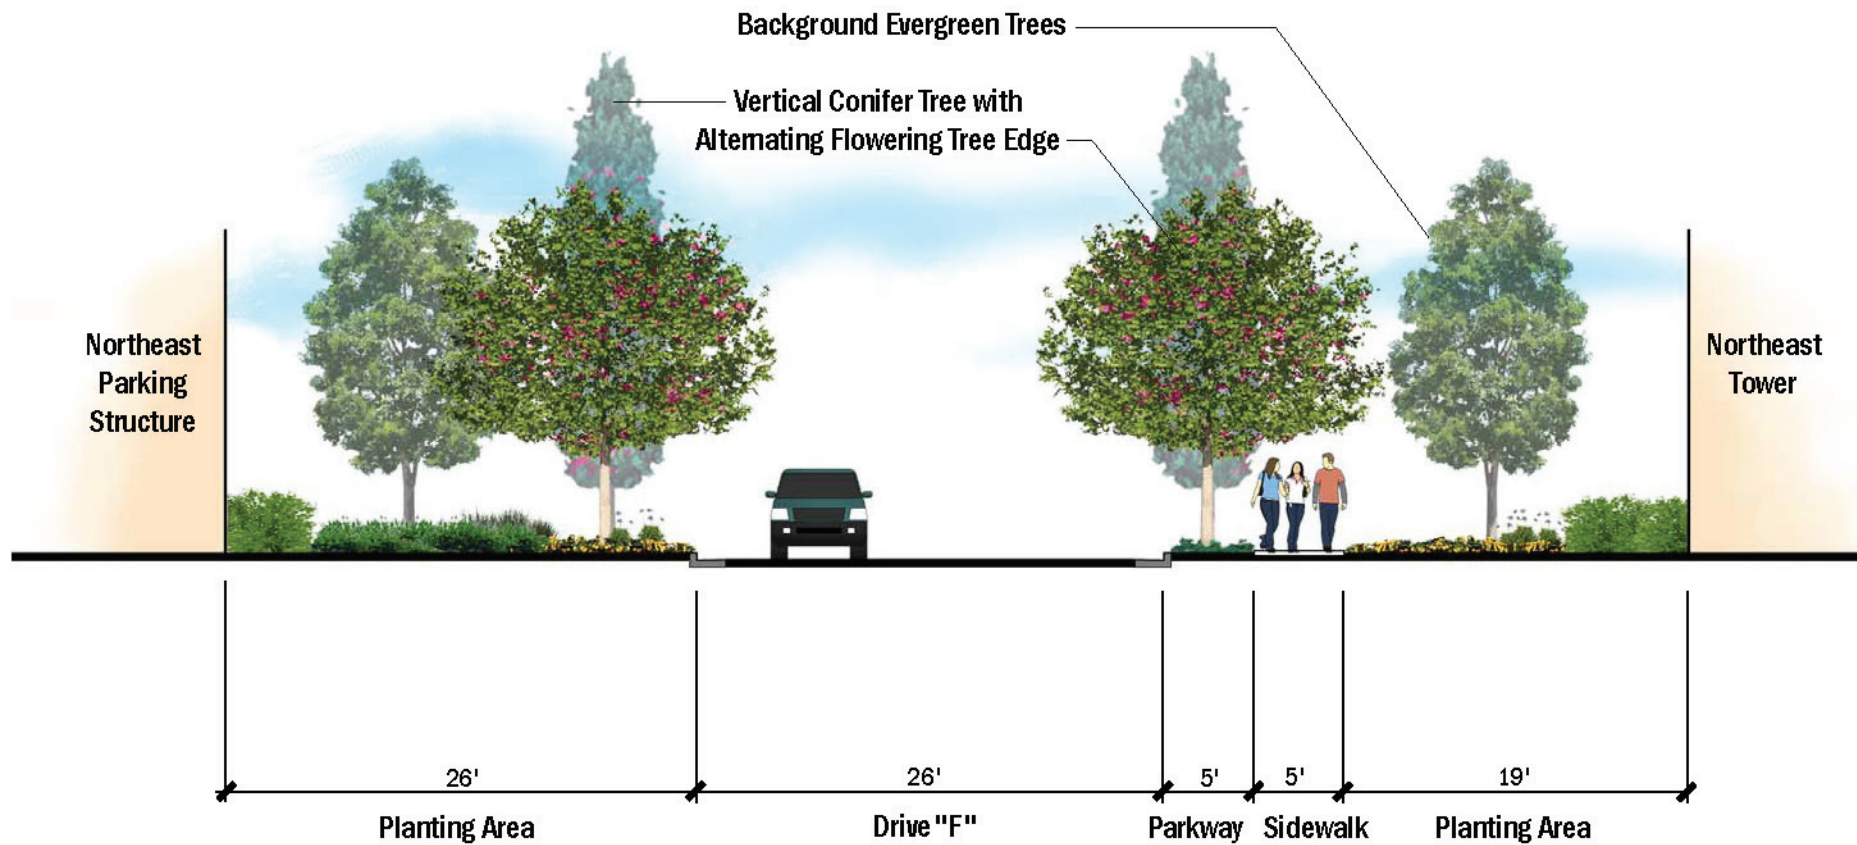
, Streetscape - Drive "F" at Northeast Parking Structure
